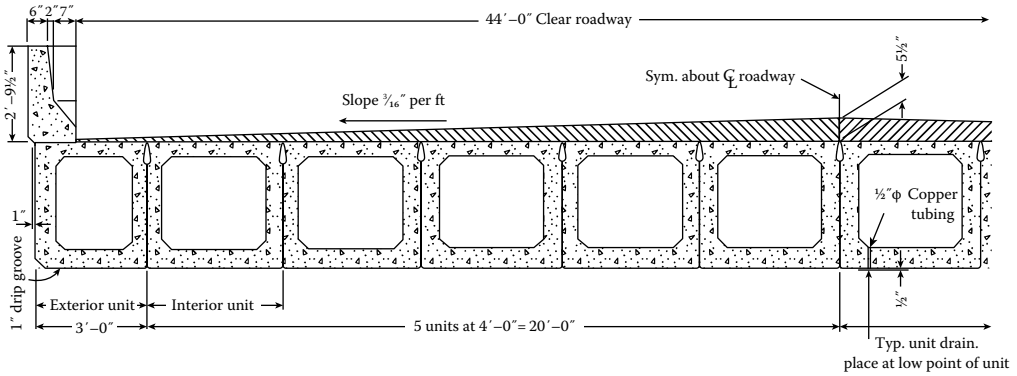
Cross section of a precast, prestressed spread box beam superstructure. In this cross section, 3 ft wide box beams are used as exterior girders with 4 ft wide box beams as interior girders.
